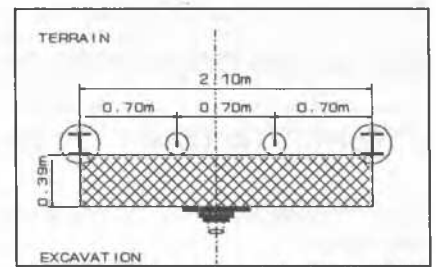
Plan View of a Standard 2.1m Wide Panel in the Top Half Portion of the ERS (notice the micro-piles).
